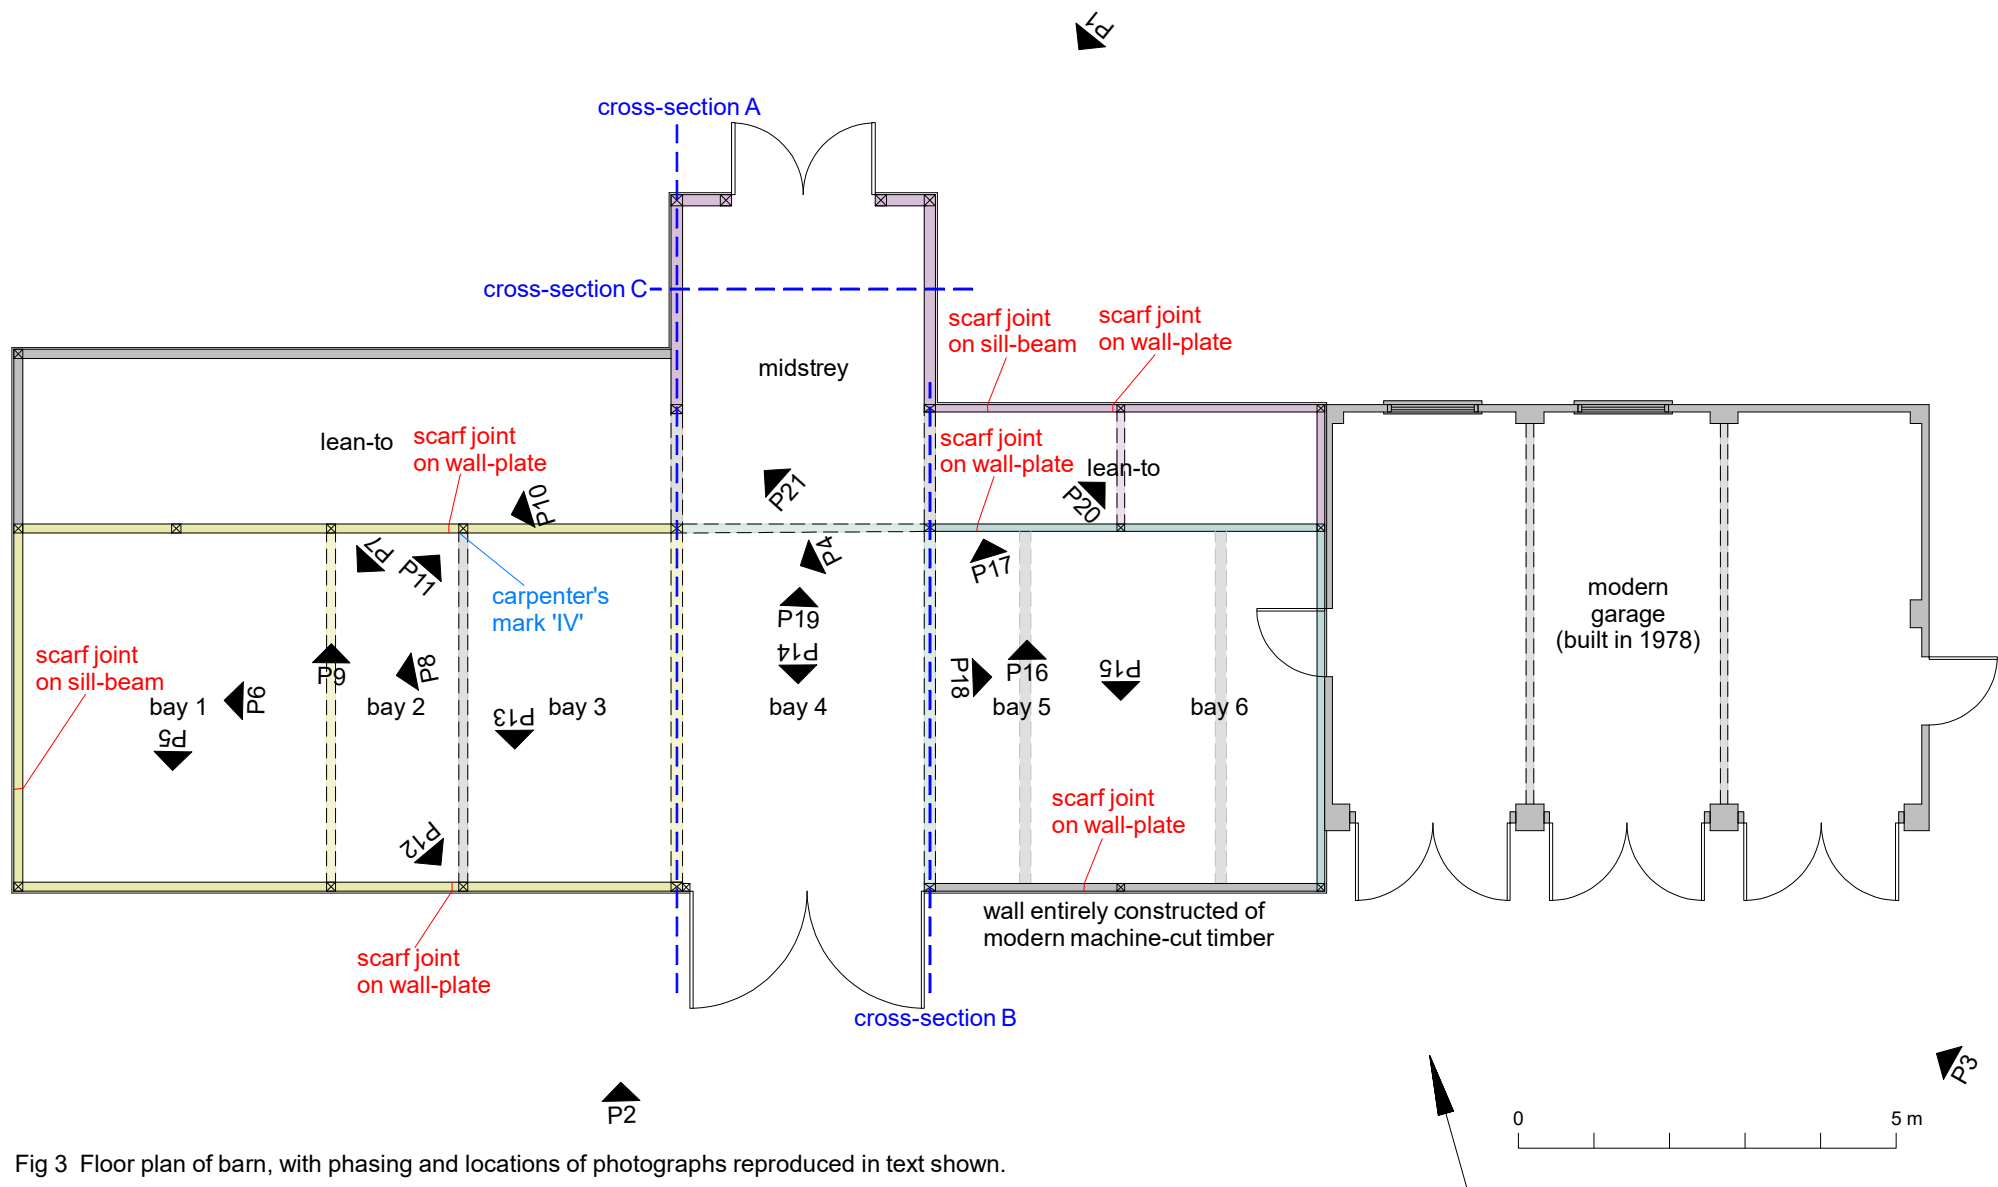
Floor plan of barn, with phasing and locations of photographs reproduced in text shown.
